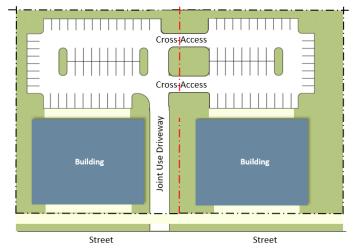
Joint Use Driveways/Cross-Access.
